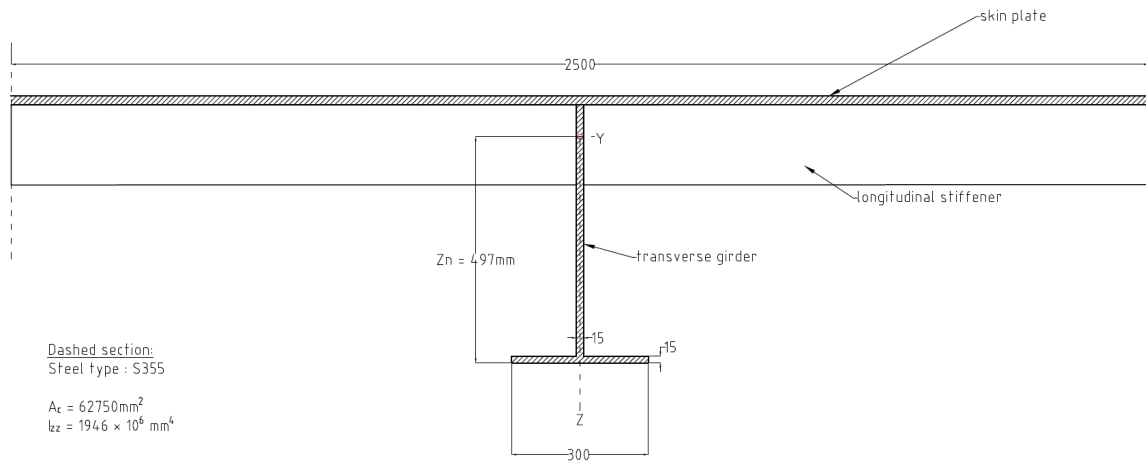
Design dimensions of the transverse girders (skin plate and transverse girder)
